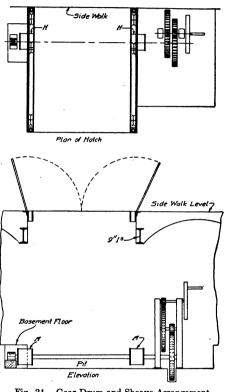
Gear Drum and Sheave Arrangement for Basement Elevator
